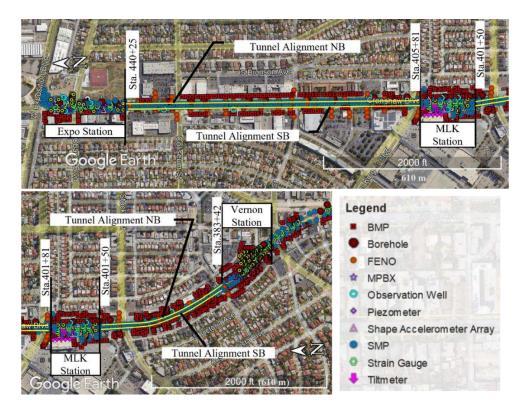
K (Crenshaw/LAX) Line Tunnel alignment and layout of the installed instrumentations
